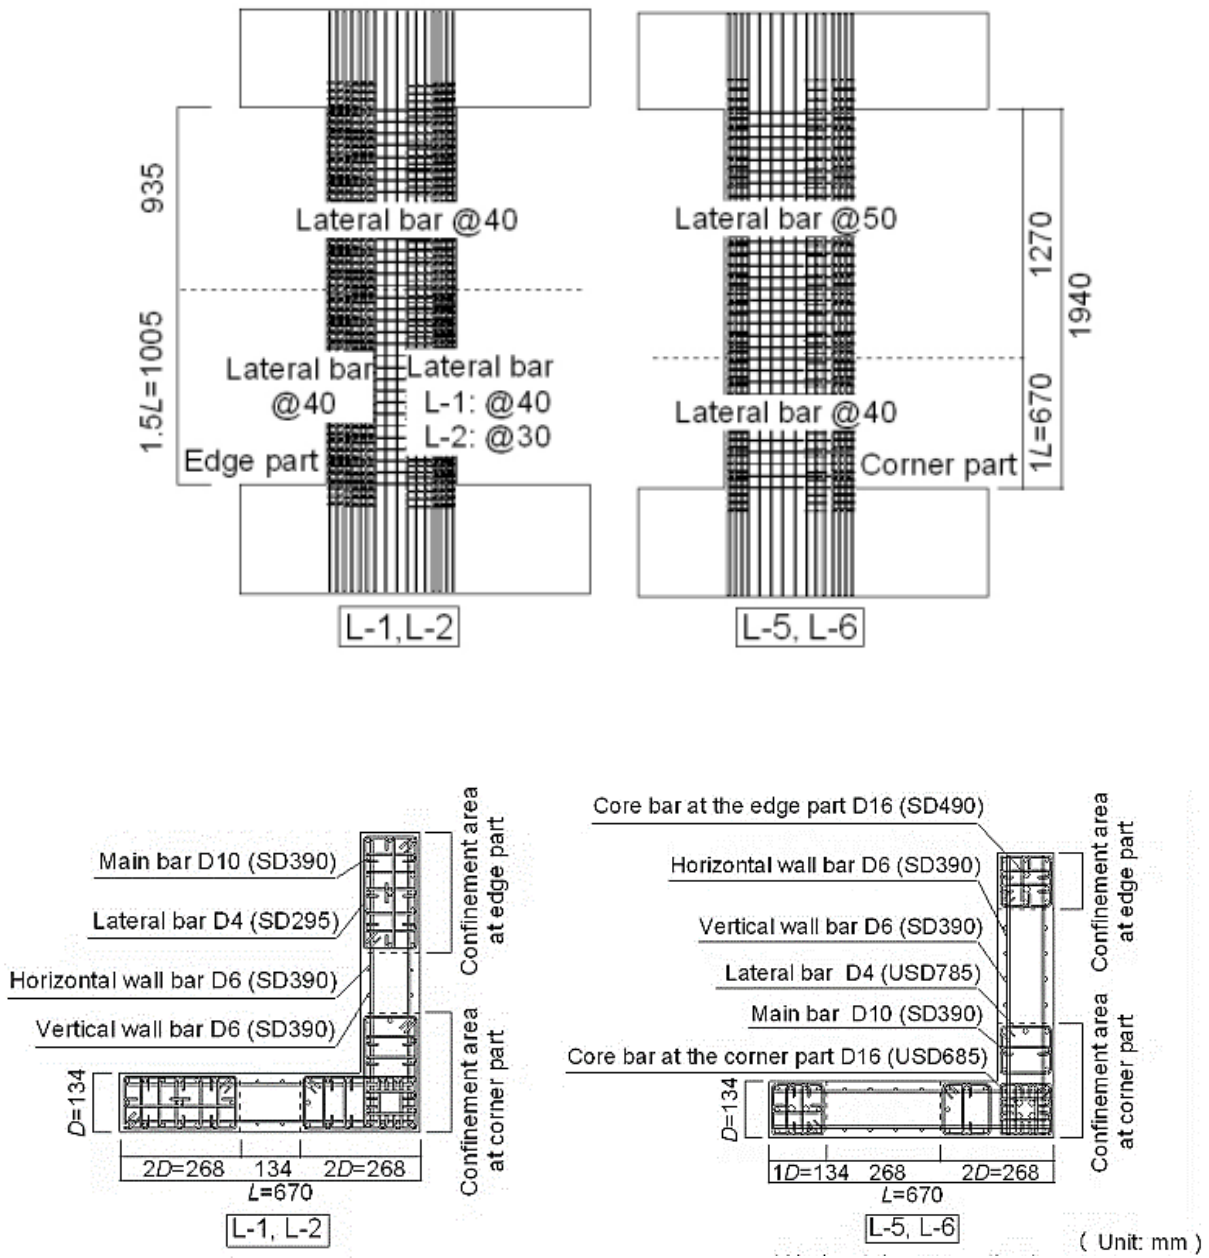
Test Specimen Geometry and Reinforcement Details for Hosaka [92]
